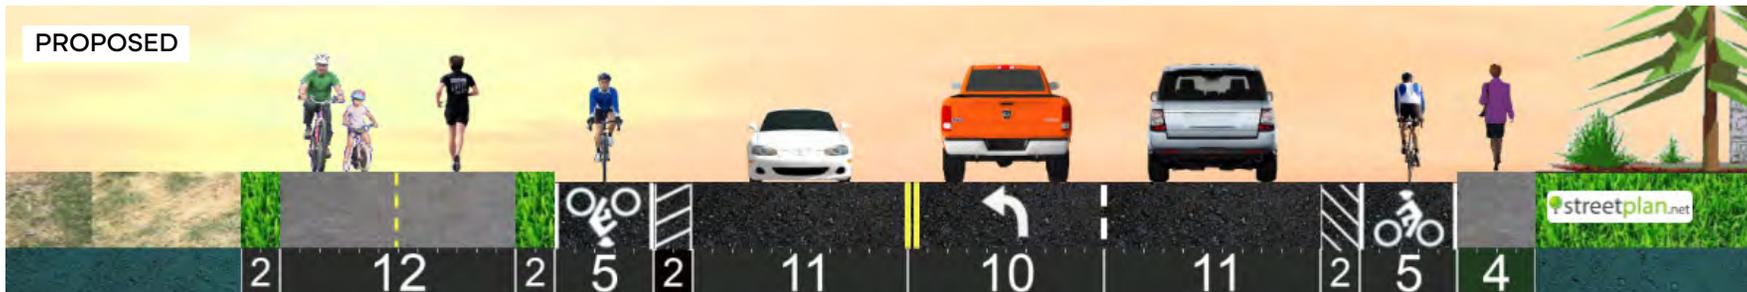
Concept: PVR west of Pecho Road, looking east
